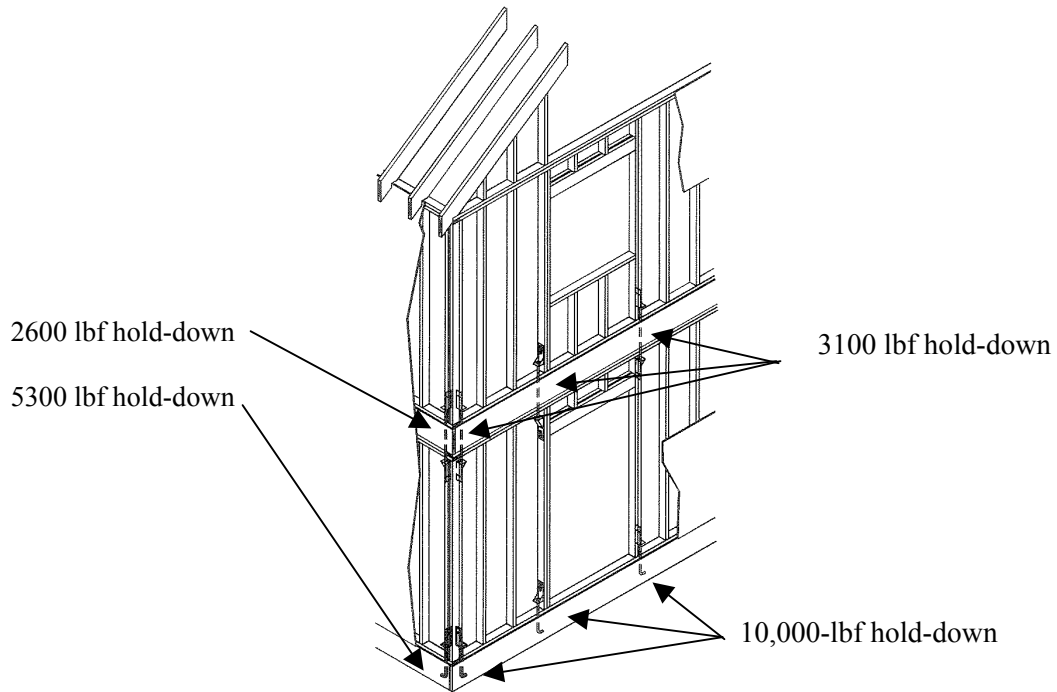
Typical Locations of hold-down connectors on 2-story house (adapted from SSTD10-99 from Southern Building Code Congress International, 1999)
